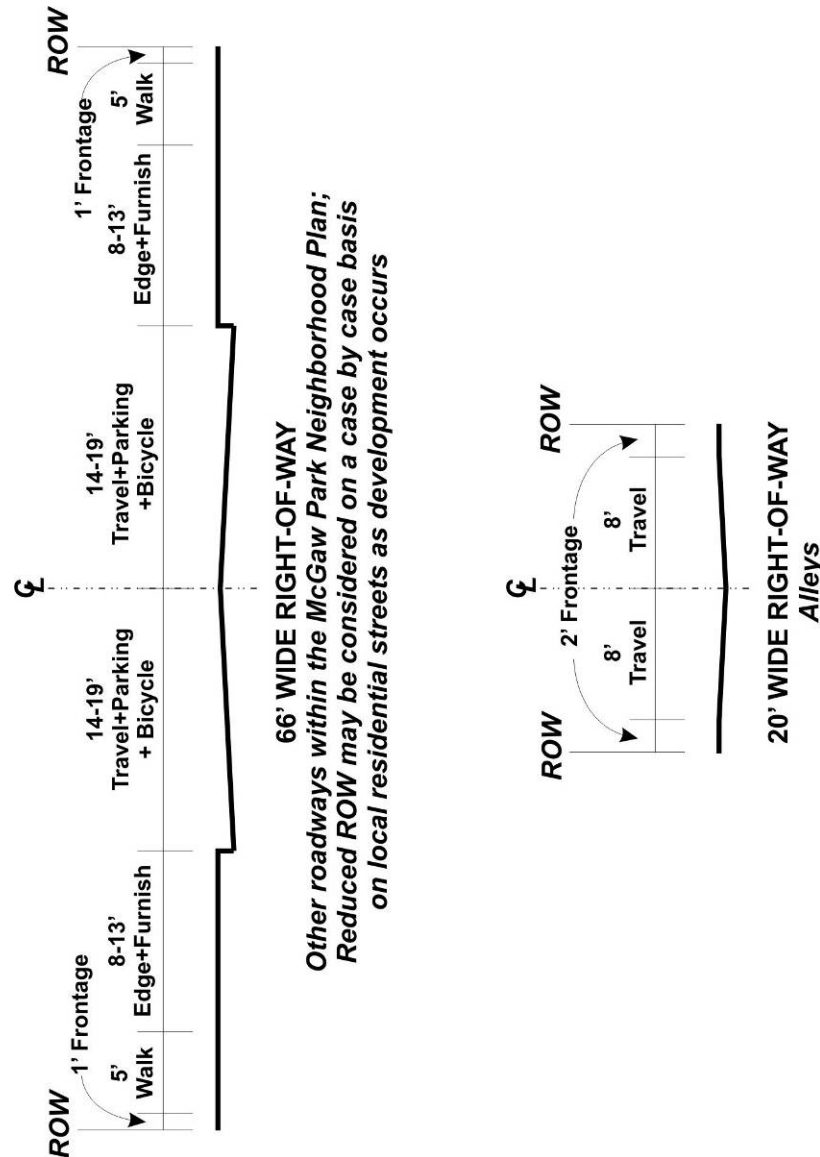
66-foot ROW, & 20-foot Alley ROW Cross-Sections
